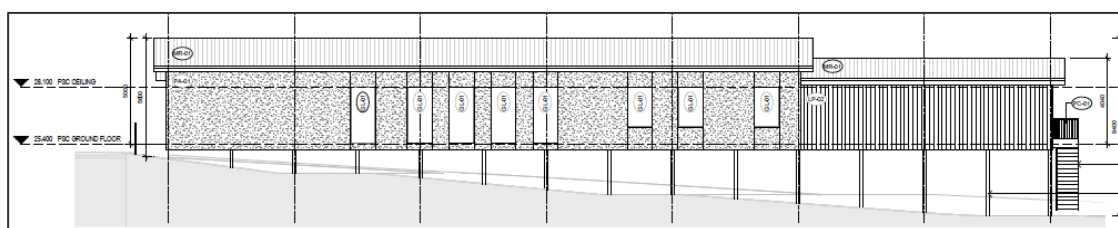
| Elevation fronting Cudgen Road (Source: Applicant's RTS)
